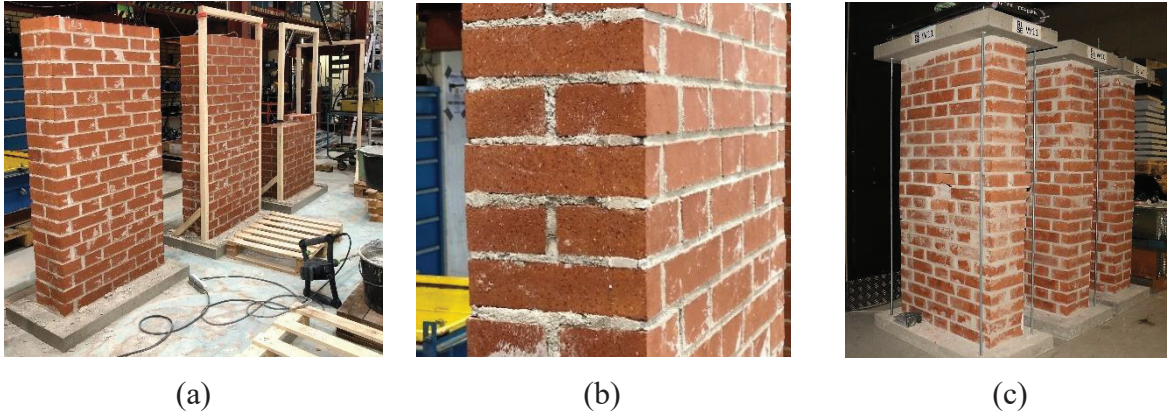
Test units under construction (a); side view on Flemish brickwork (b); the test units after being tested (c).
